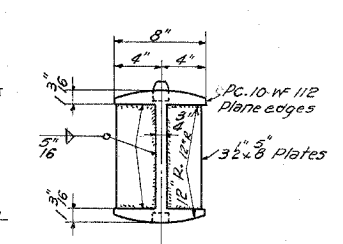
DETAIL OF DIAPHRAGM-D2 AT SO. ABUT.
